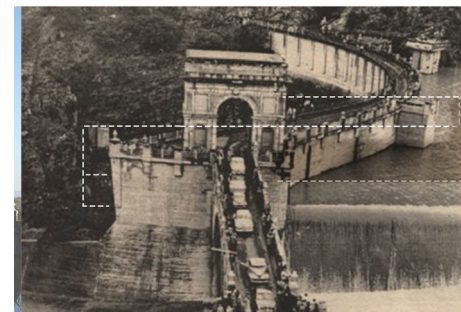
the Arch on the dam wall (Ewisa. 2016).
